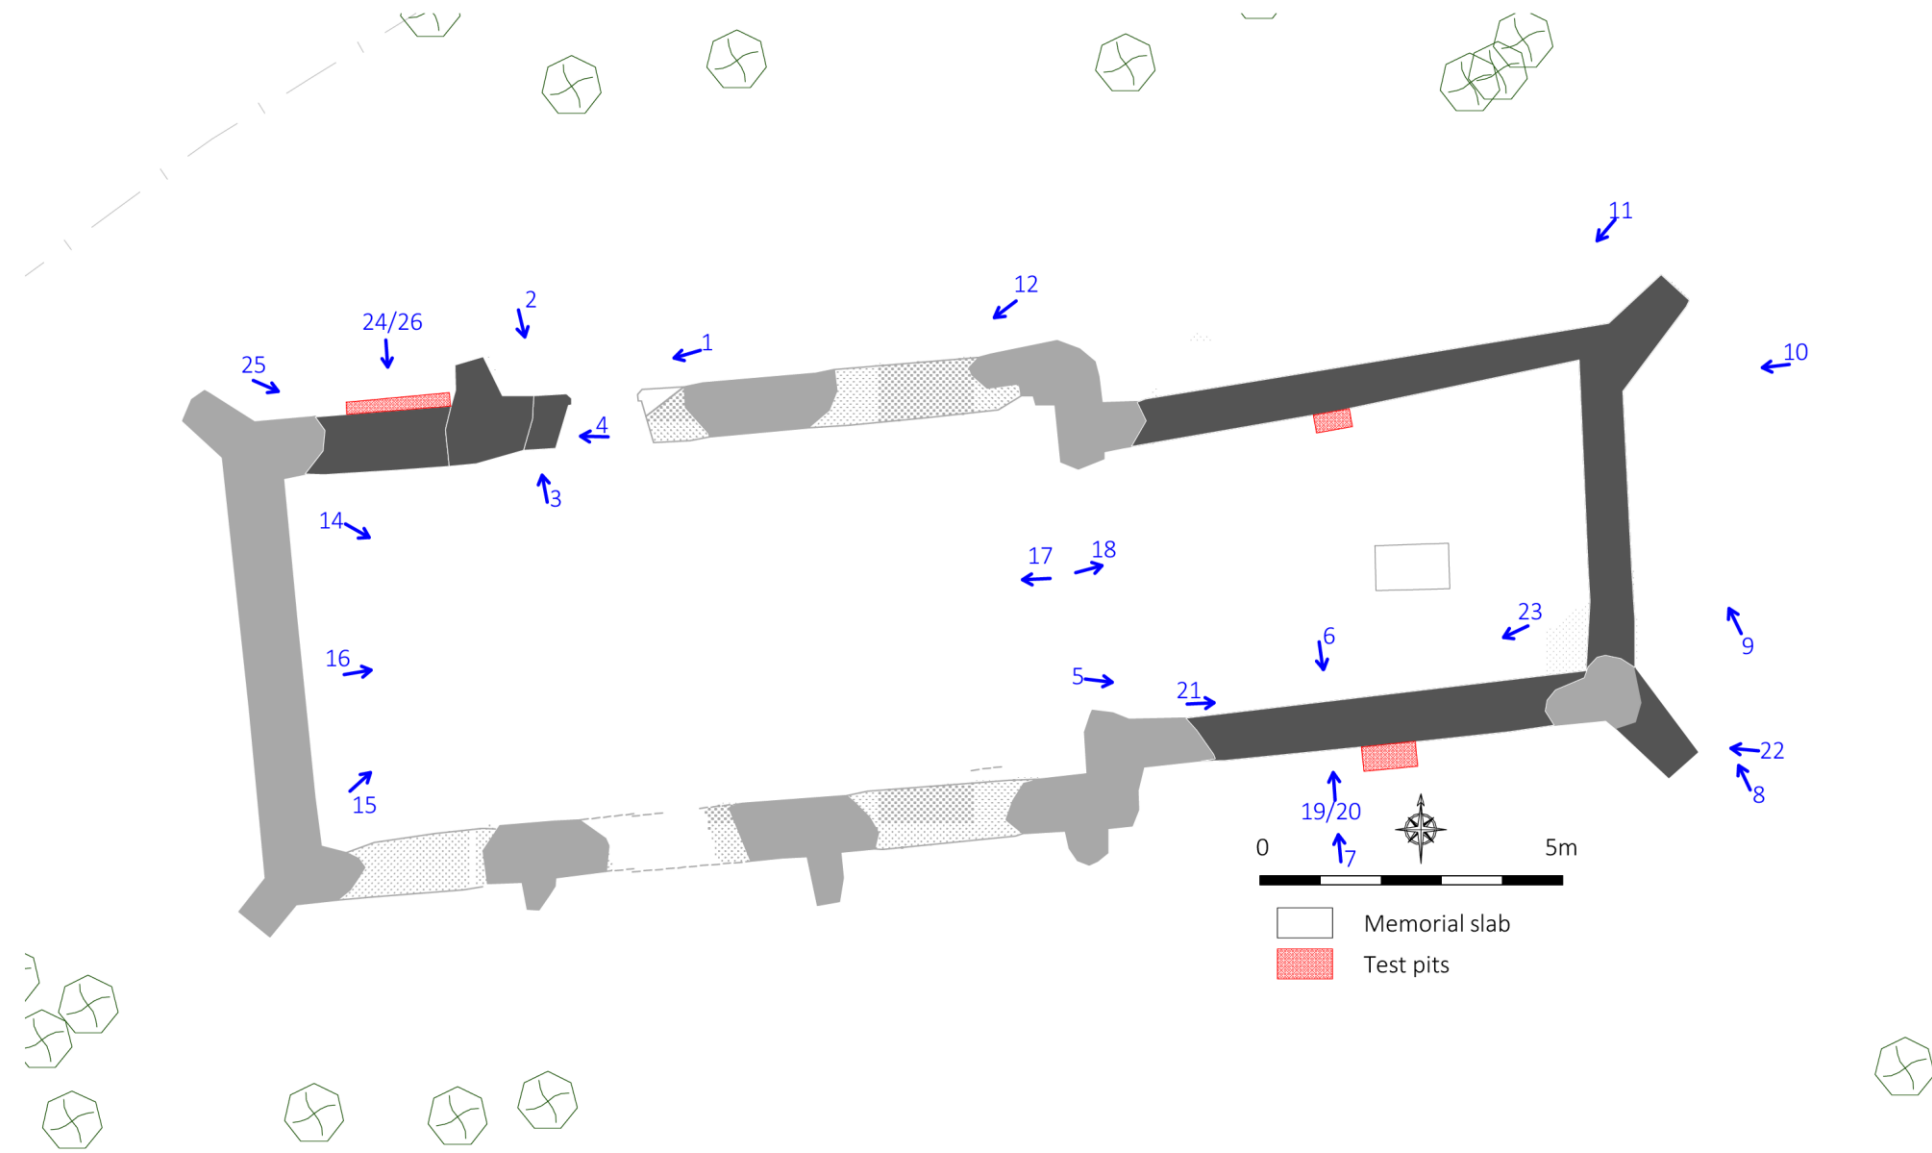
Photo plan 14<sup>th</sup> September 2022 (scale 1:125)
